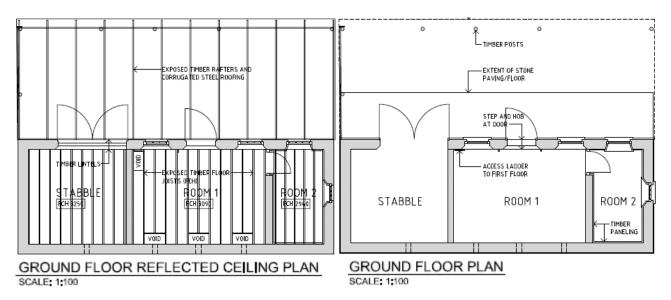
Plans of the Stone Stable building. (Source: BHP 2013)
